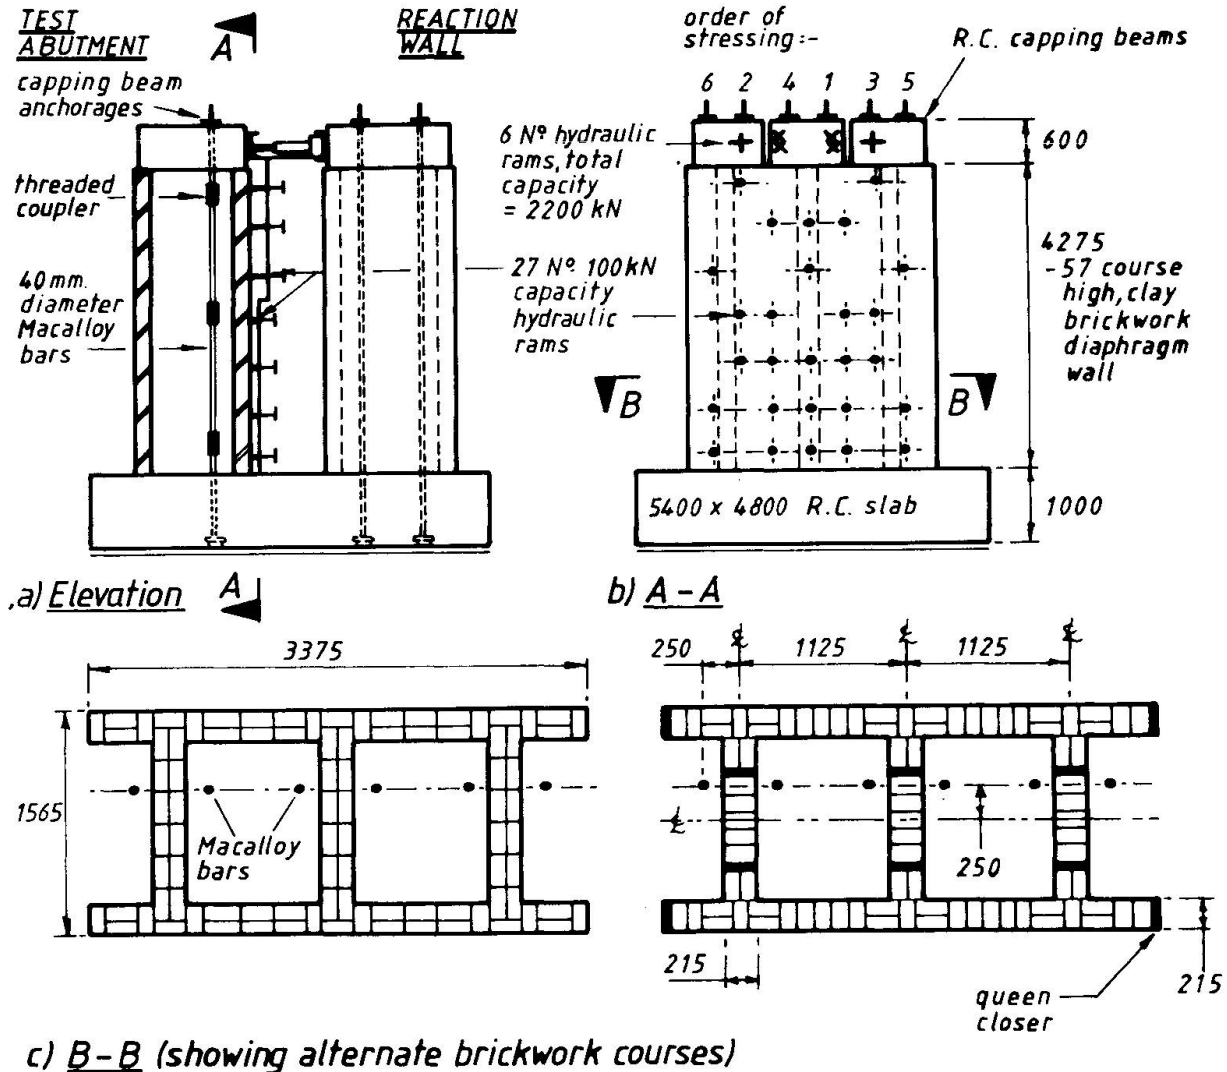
Details of test arrangement (All dimensions are in millimetres)
